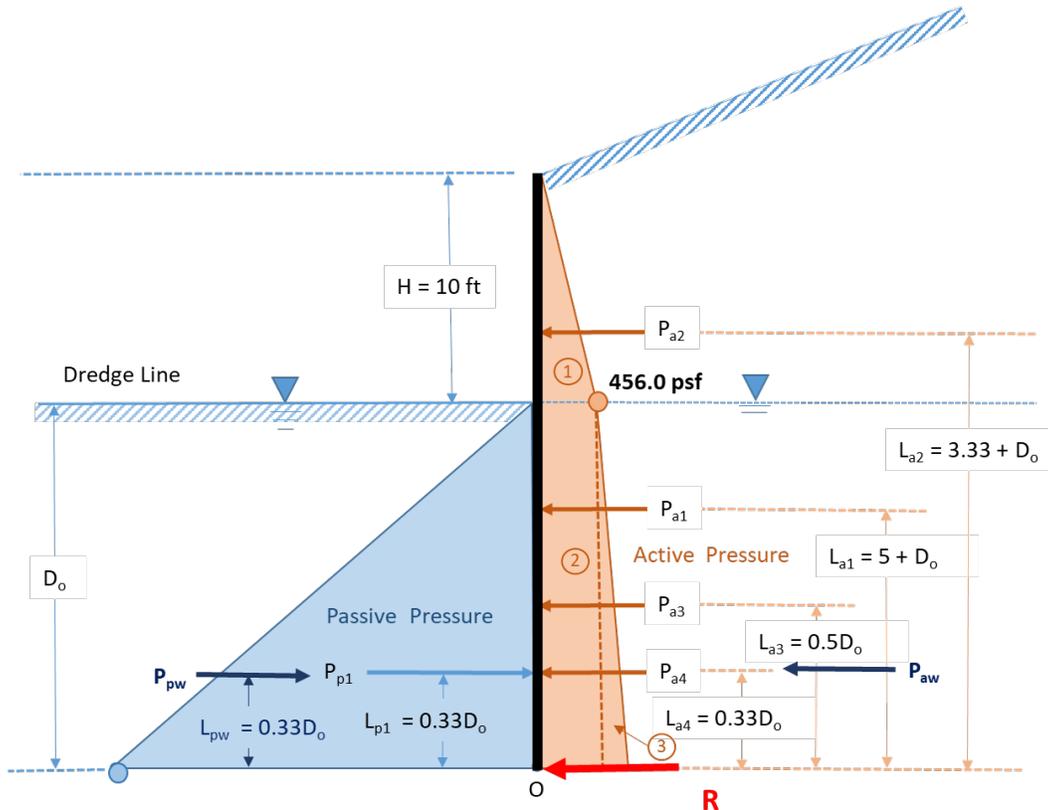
Case 2 Location of forces acting on the sheet pile wall, backfill slope = 20°.
